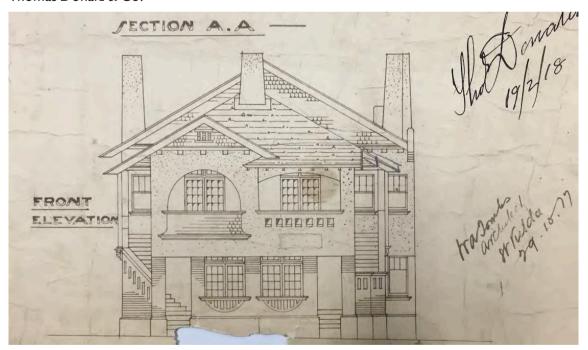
Elevation from the original building plans with architect's signature at right and builder's signature above
